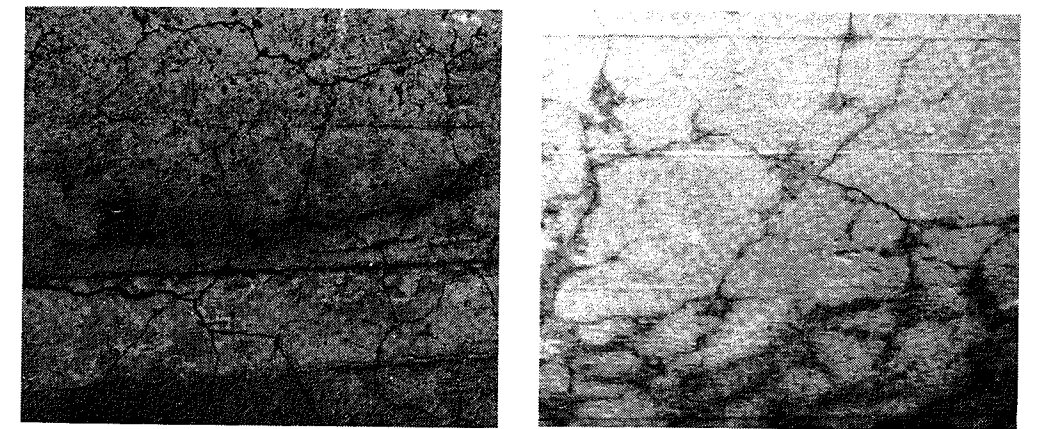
left, right. Two aspects of map cracking on massive concrete blocks.
